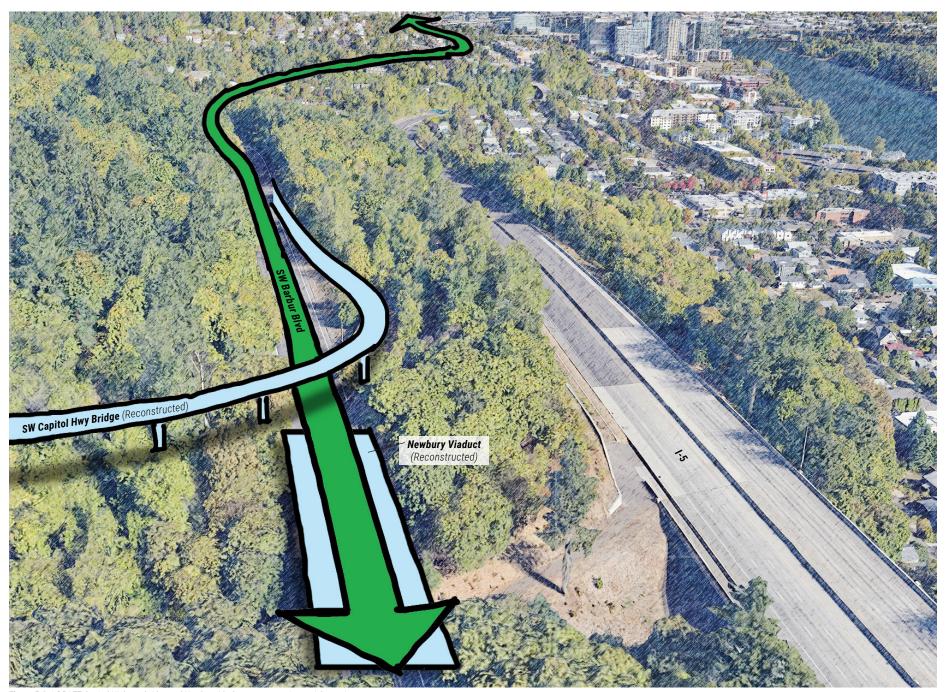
DRAFT Capitol Highway bridge and Newbury Viaduct reconstruction aerial overview
